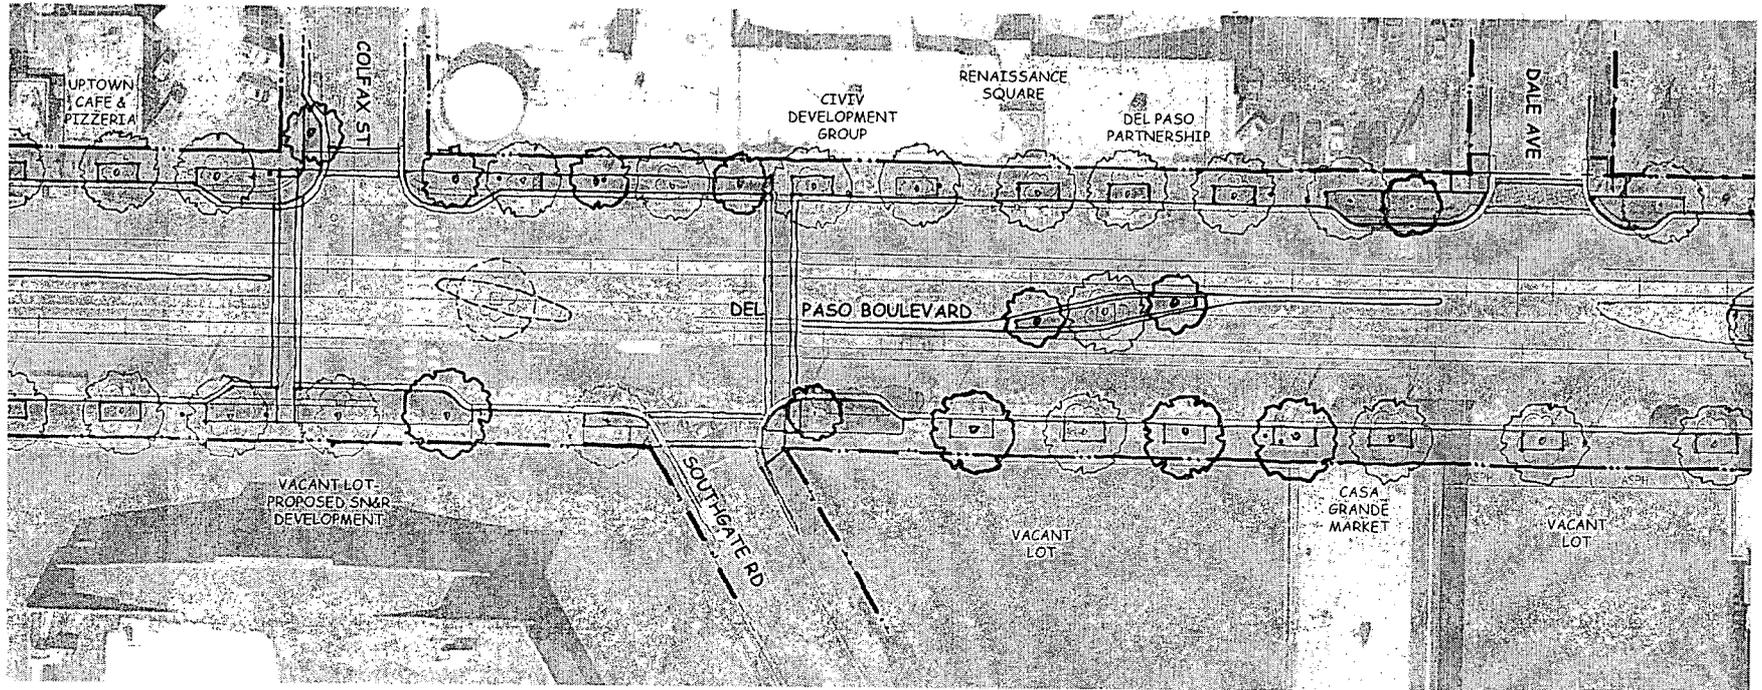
% Design Plans – Dale Avenue to Edgewater Road
